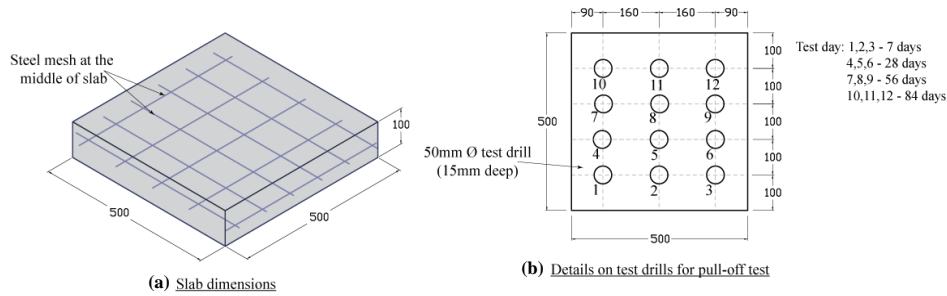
(a) Details of slab specimen; (b) Test drill locations for pull-off tests.
